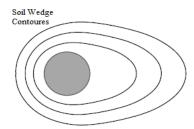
An example plan showing the effective soil wedge around the concrete pile in terms of contour lines [10]
